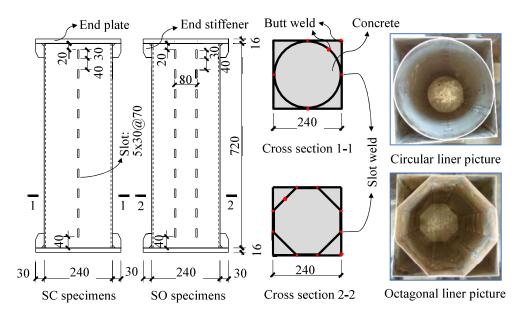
Dimensions and configuration details of the SC and SO specimens (unit: mm)
